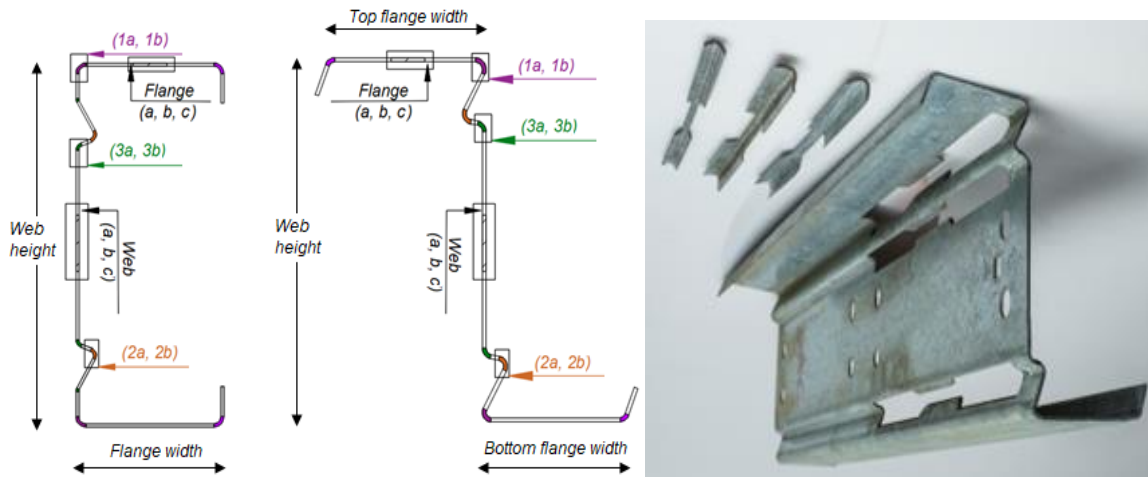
Locations of extracted tensile specimens (a) channel cross section, (b) zed cross section, and (c) typical curved specimens extracted from curved locations 1, 2, 3 of the zed section.
